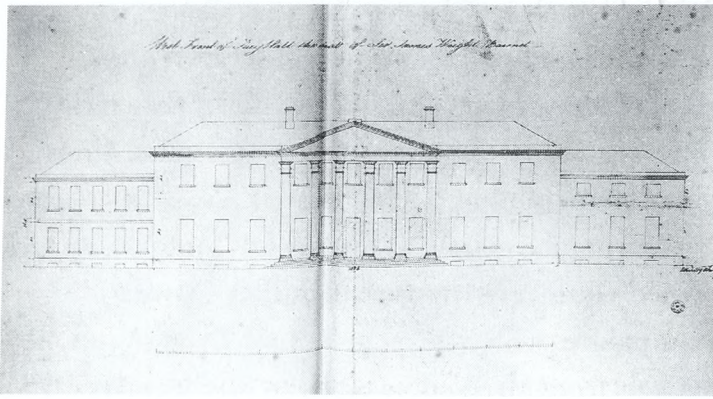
Robert Adam, proposed west elevation of Ray Hall, c.1773. *Sir John Soane's Museum.
